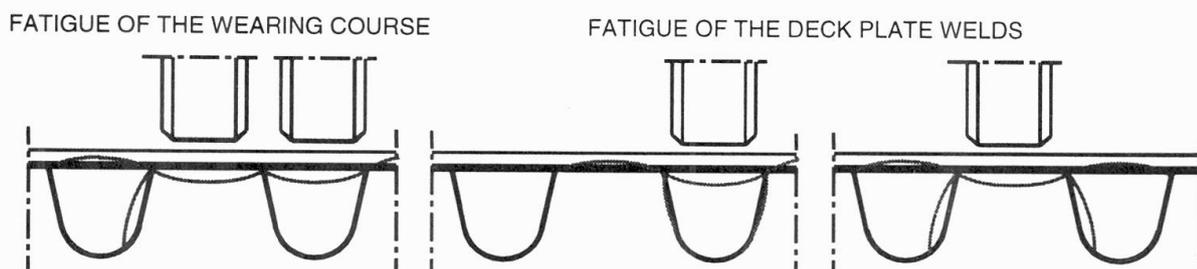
Effects of local wheel loading on orthotropic steel bridge decks
